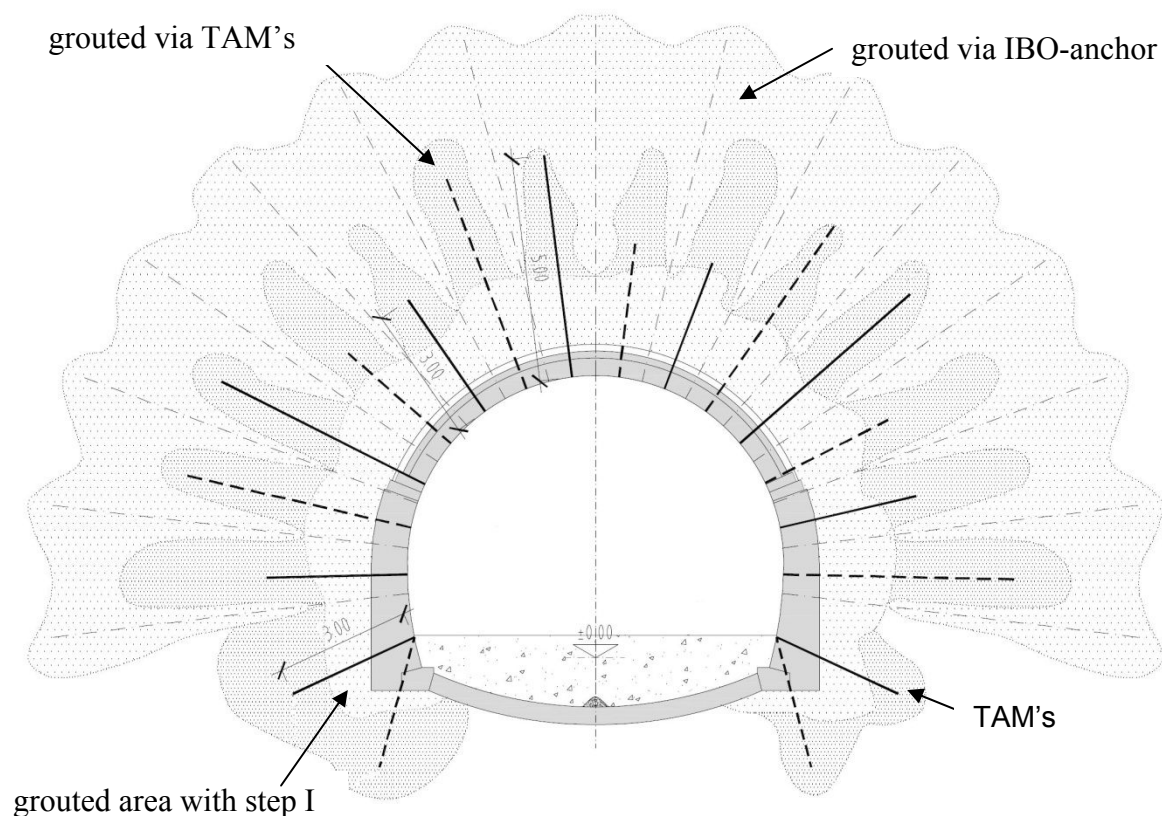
, grouting via TAM's (source Beton- und Monierbau)
